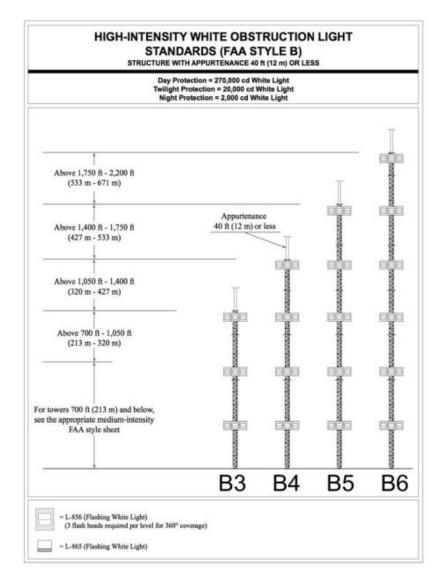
High-Intensity White Obstruction Light Standards (FAA Style B)—With Appurtenance 40 Feet or Less
